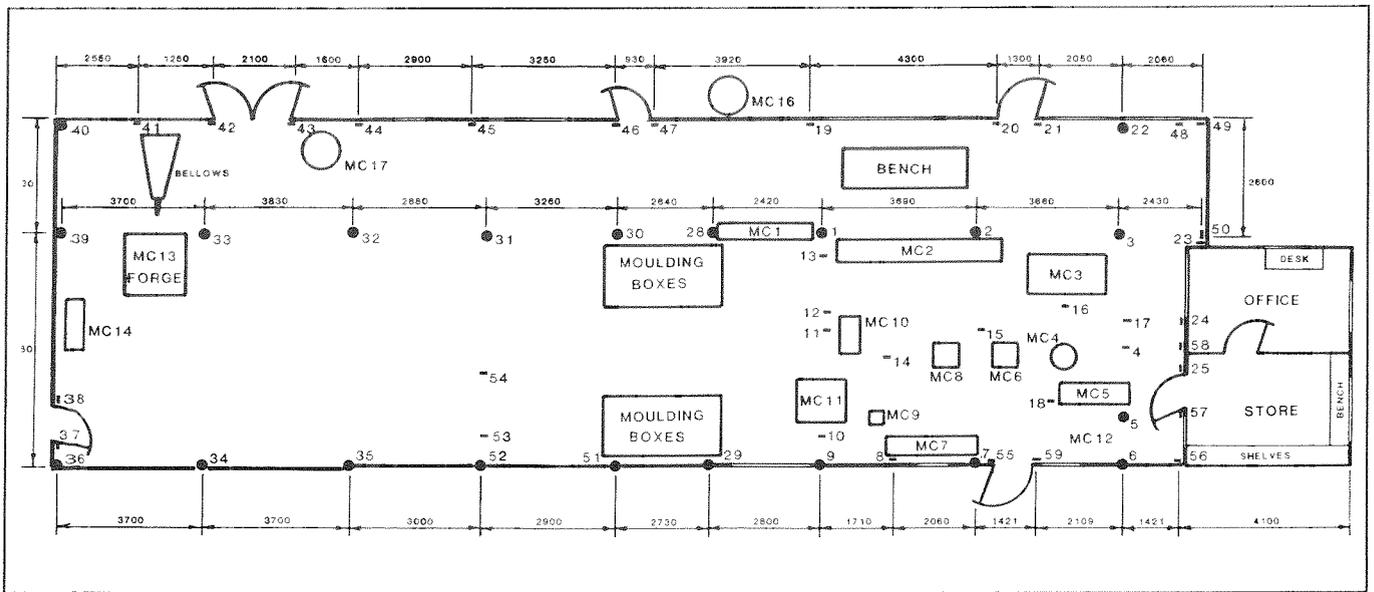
Plan of Laycock's Foundry when still in situ at 108-110 Seymour Street, Bathurst, New South Wales. The blacksmith's shop of the 1880s had been extended in 1892 to include a machine-shop and foundry. In 1917 the position of the machine-shop and foundry was inverted to form the layout shown on this plan. (Reproduced by courtesy of J.W. Gibson from Gibson 1988: vol. 2, Appendix J2)
